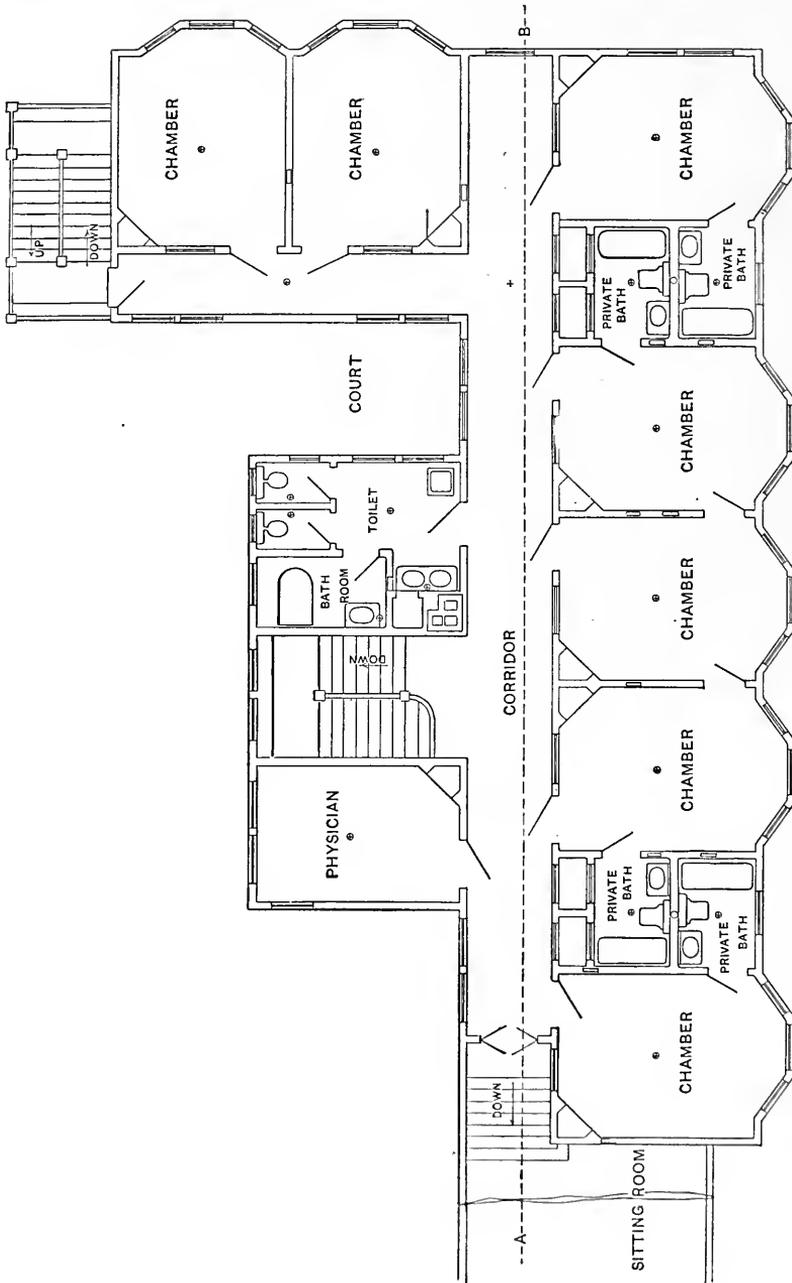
Floor plan of a portion of the Pottenger Sanatorium, showing arrangement of rooms on one side of corridor whereby cross ventilation is obtained through doors and transoms opening into the corridor. All corners are round. All patient's rooms have bay window frontage.
